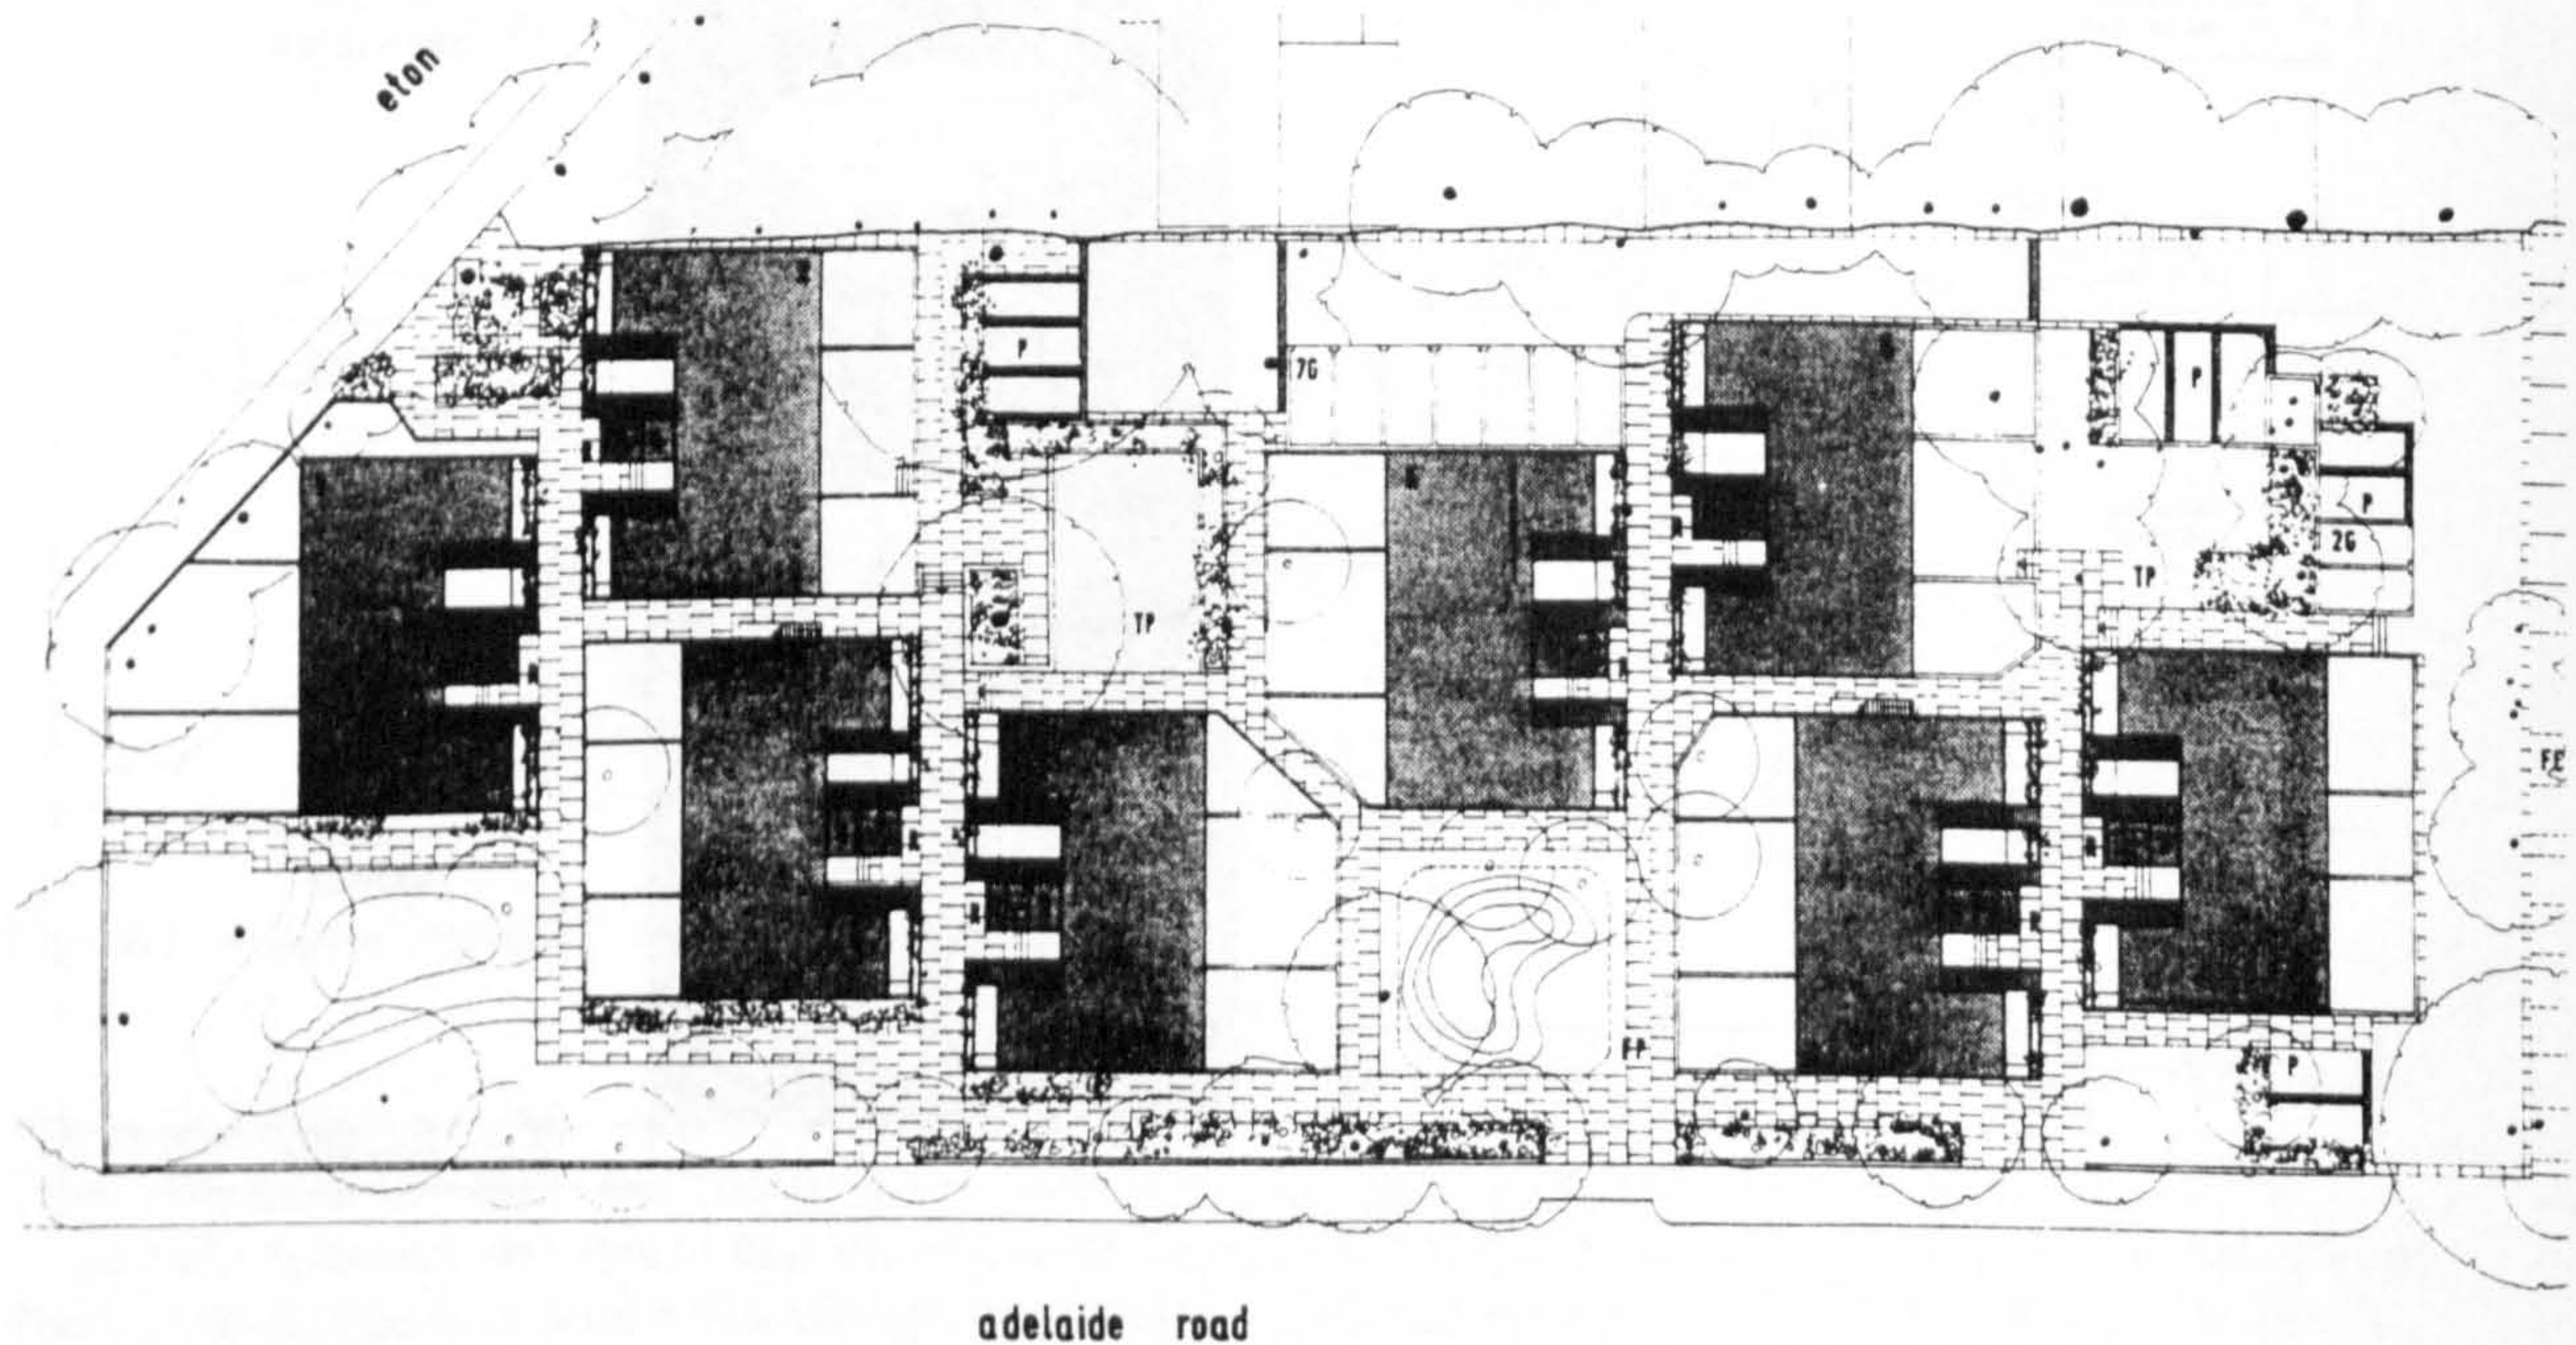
Adelaide Road: site plan<sup>41</sup>
